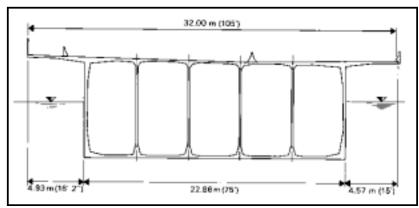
Cross-section of structure with location of longitudinal post-tensioning cables
